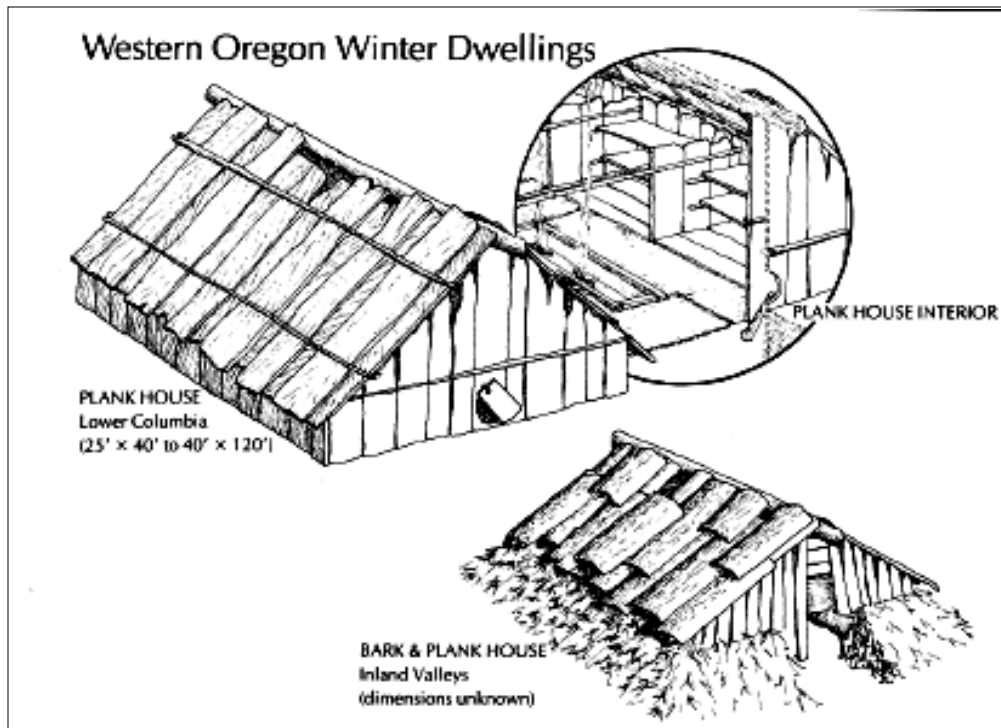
Illustration of Plankhouse construction (Faun Rae Hosey from Zucker et al. 1983)
